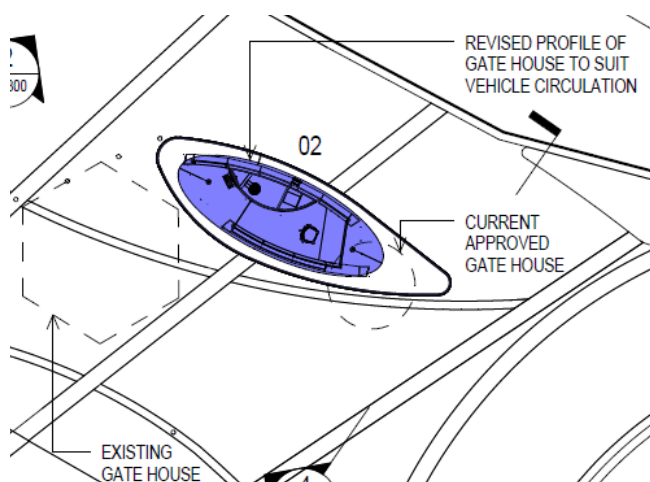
Extract from Plans showing proposed Gate House, with approved and existing Gate Houses outlined.
